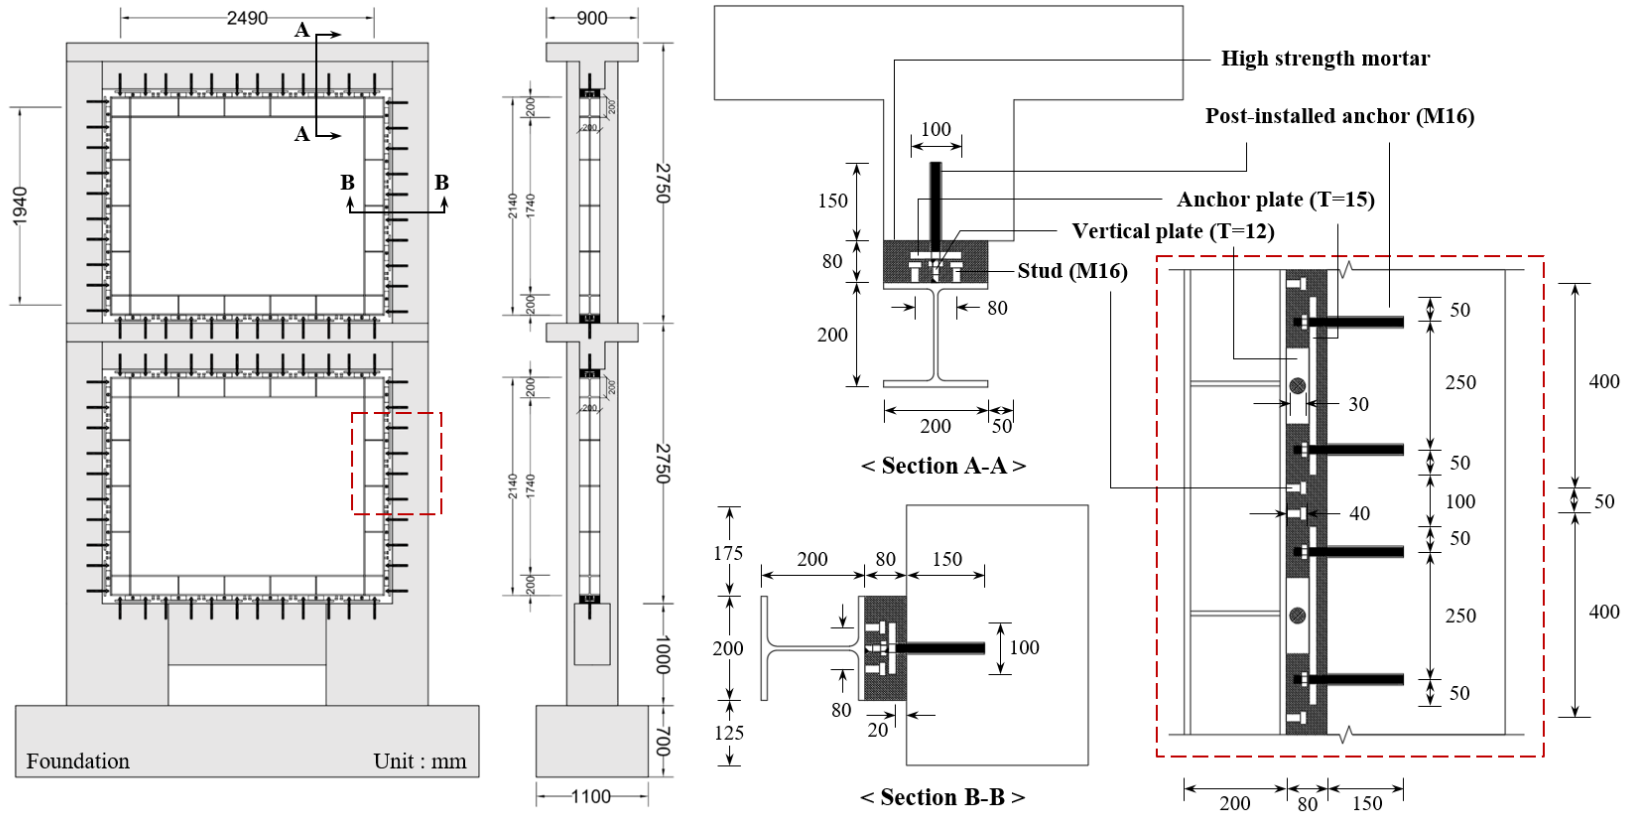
Dimensions and connection details of specimen retrofitted with internal steel moment frame (IN-1)
